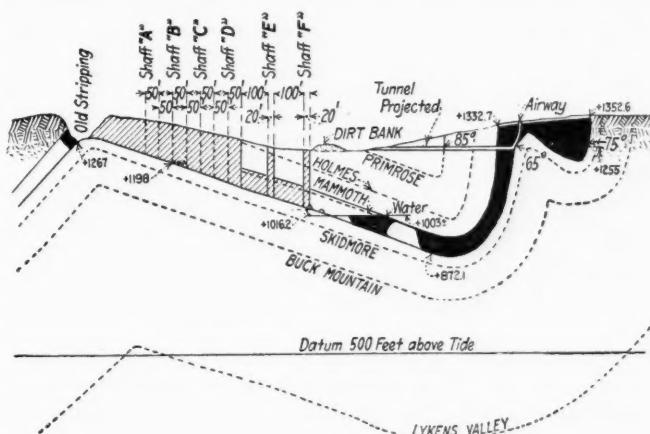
CROSS-SECTION THROUGH BARRIER AT SUMMIT HILL
